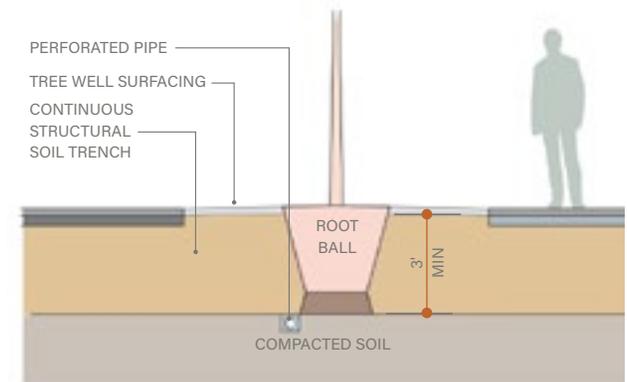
Typical Section of Sand-Based Structural Soil
